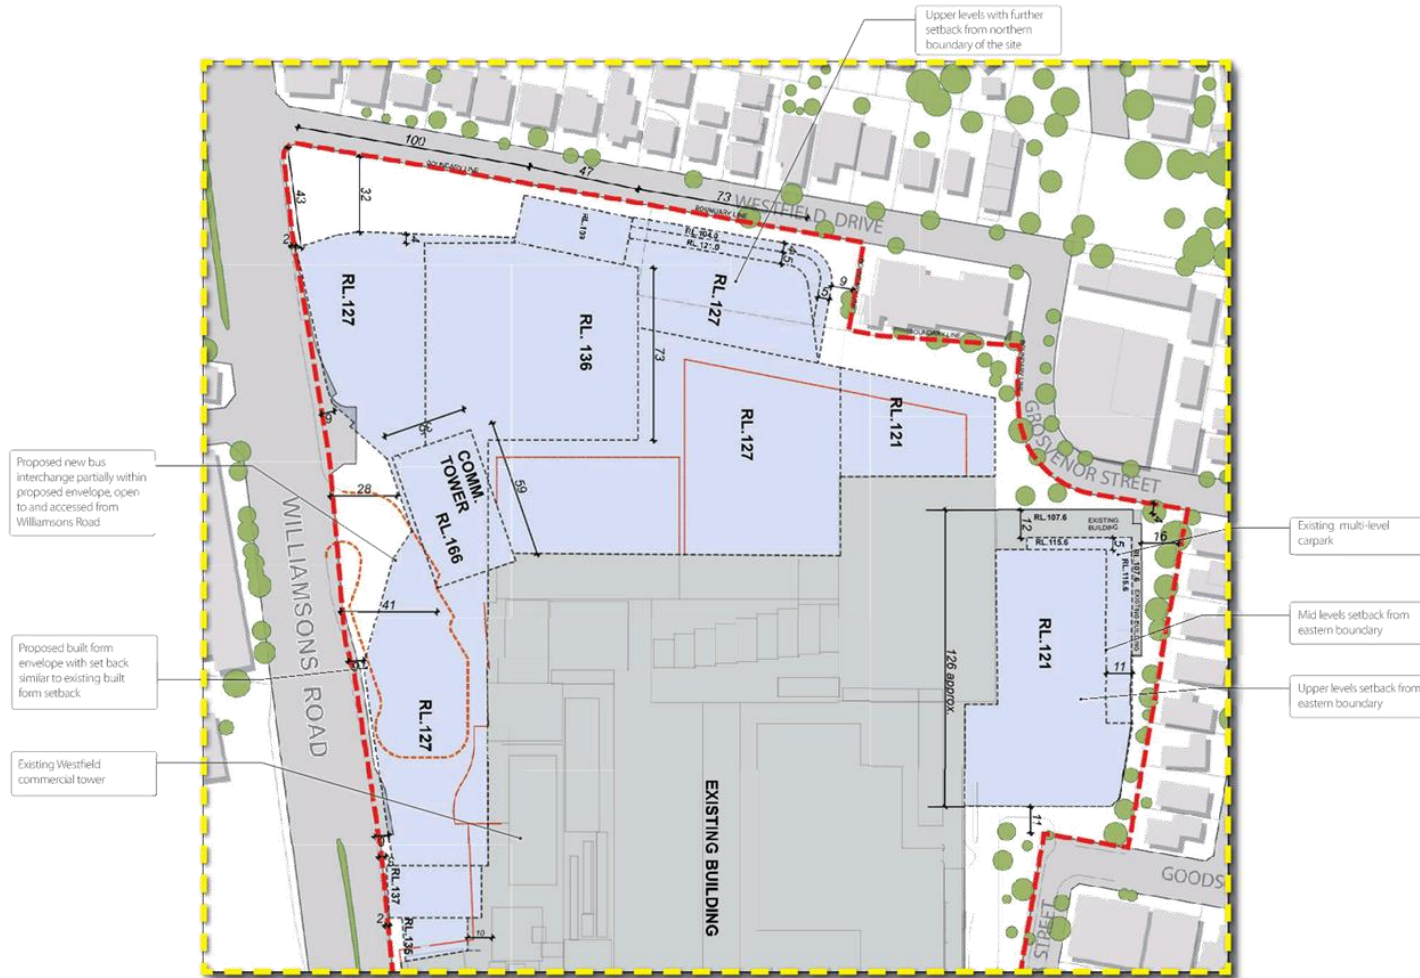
Zoom Plan 01 - Envelope Plan around the Bus Interchange
